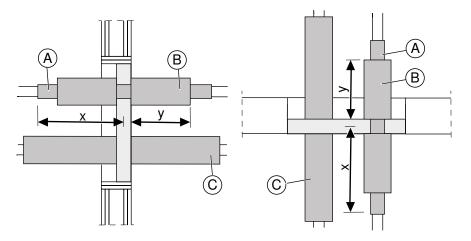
Path and protective insulation on non-combustible pipes in the wall and ceiling
